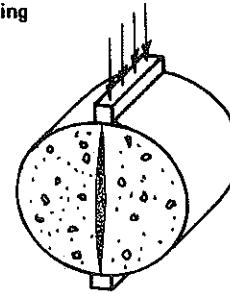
Cylindrical splitting test specimen failing under compressive load.
